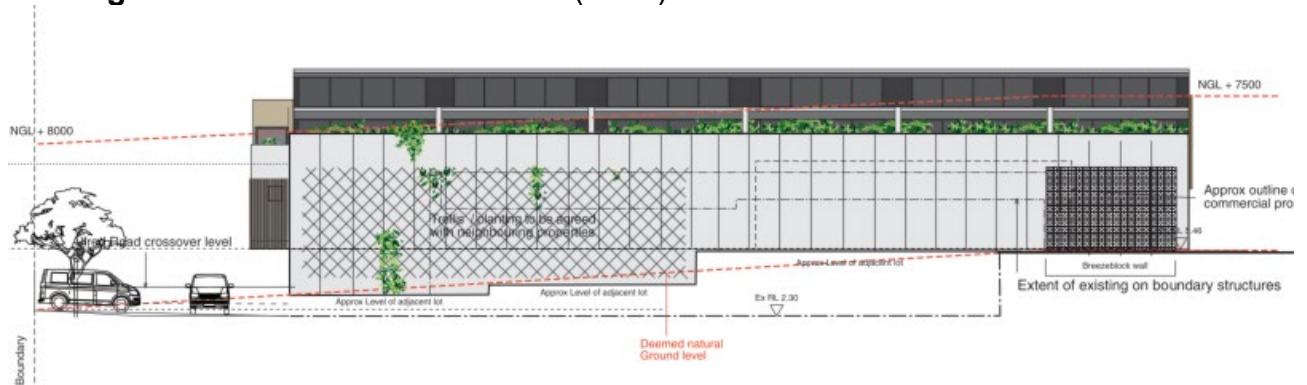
Superseded side elevation (north) – Plans dated 29 October 2021
